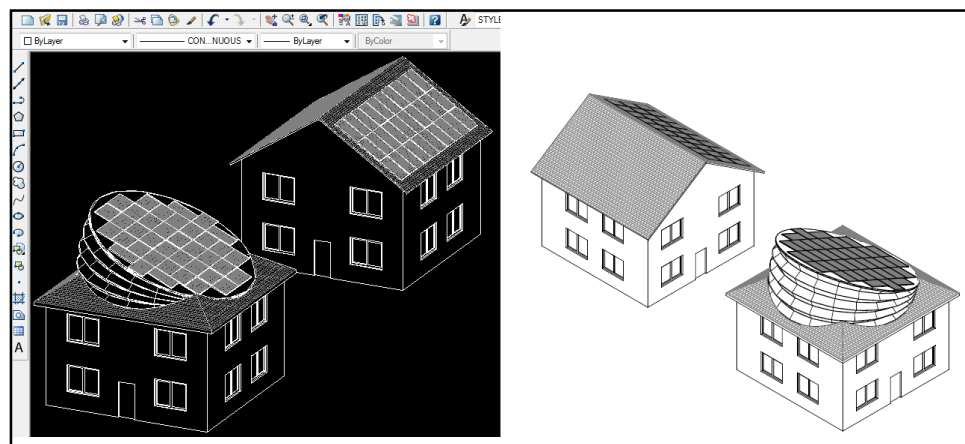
Evaluation of the panels with the rotating roof system and existing roof system in the same building in Auto-Cad environment [16].
